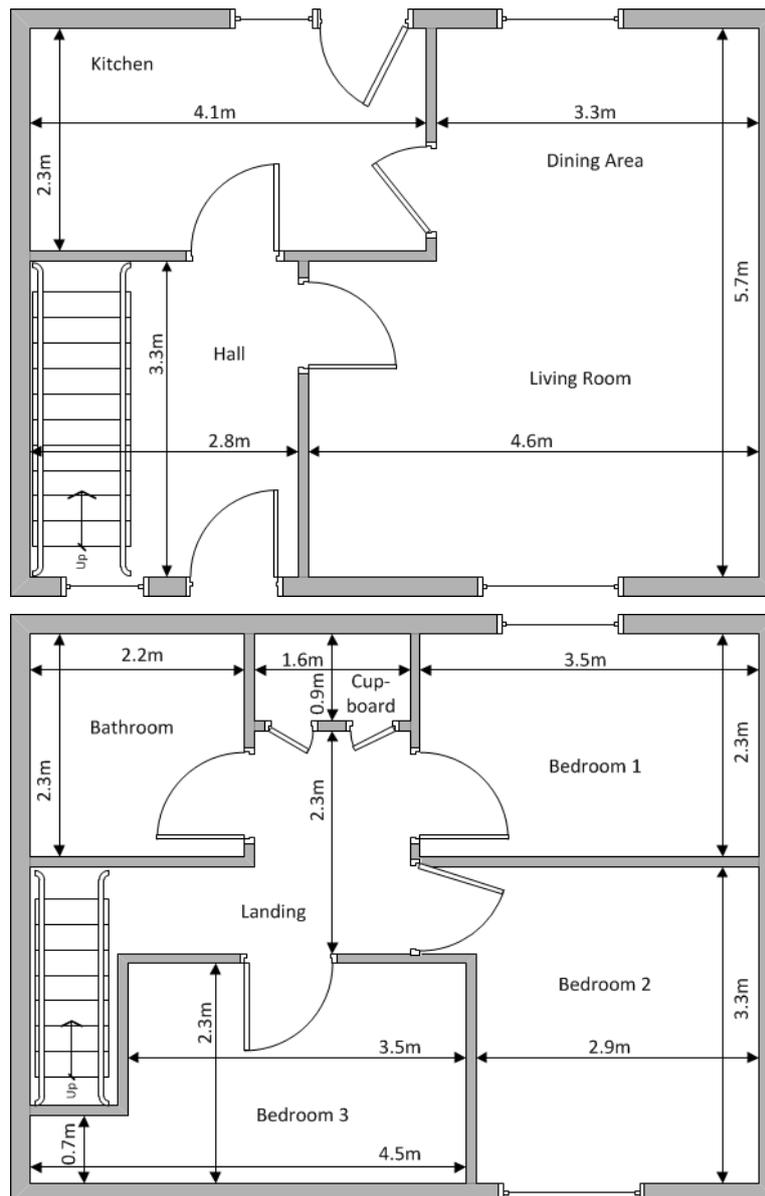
Floor plans for buildings 50.3 and 50.4 (they are identical) ground floor (top) and first floor (bottom).
